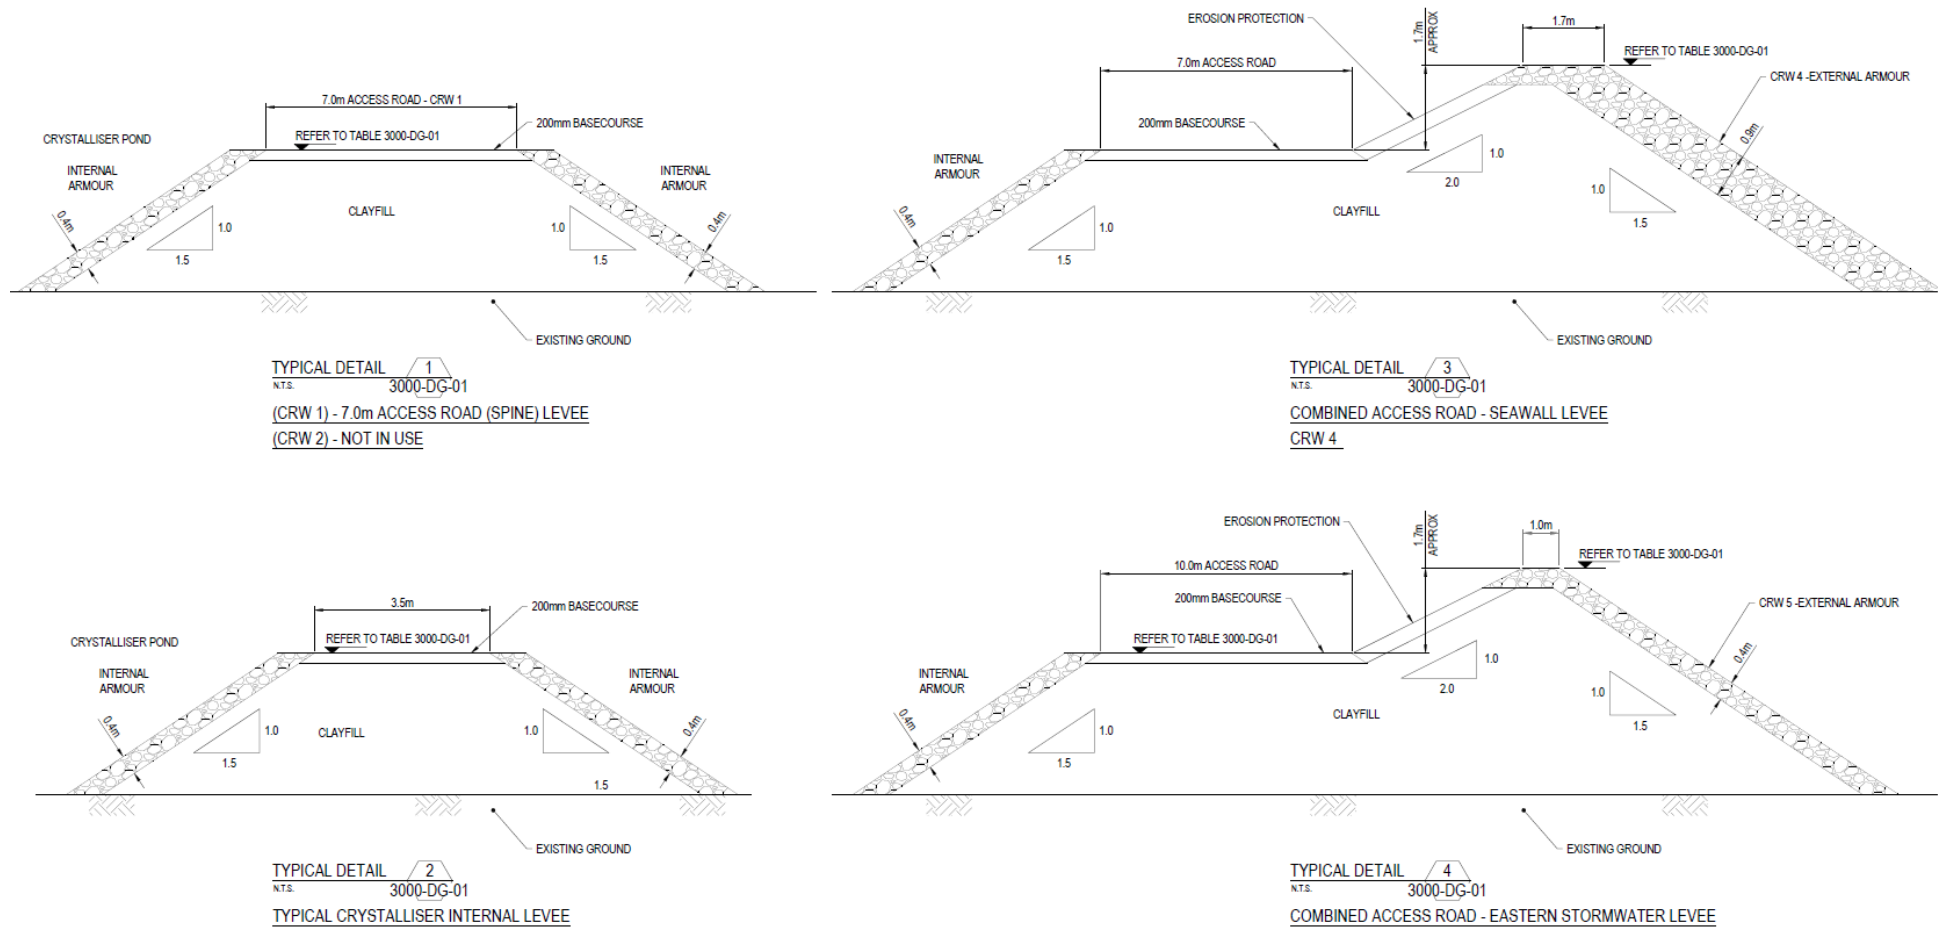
Typical Crystalliser Pond Embankment Cross Sections
